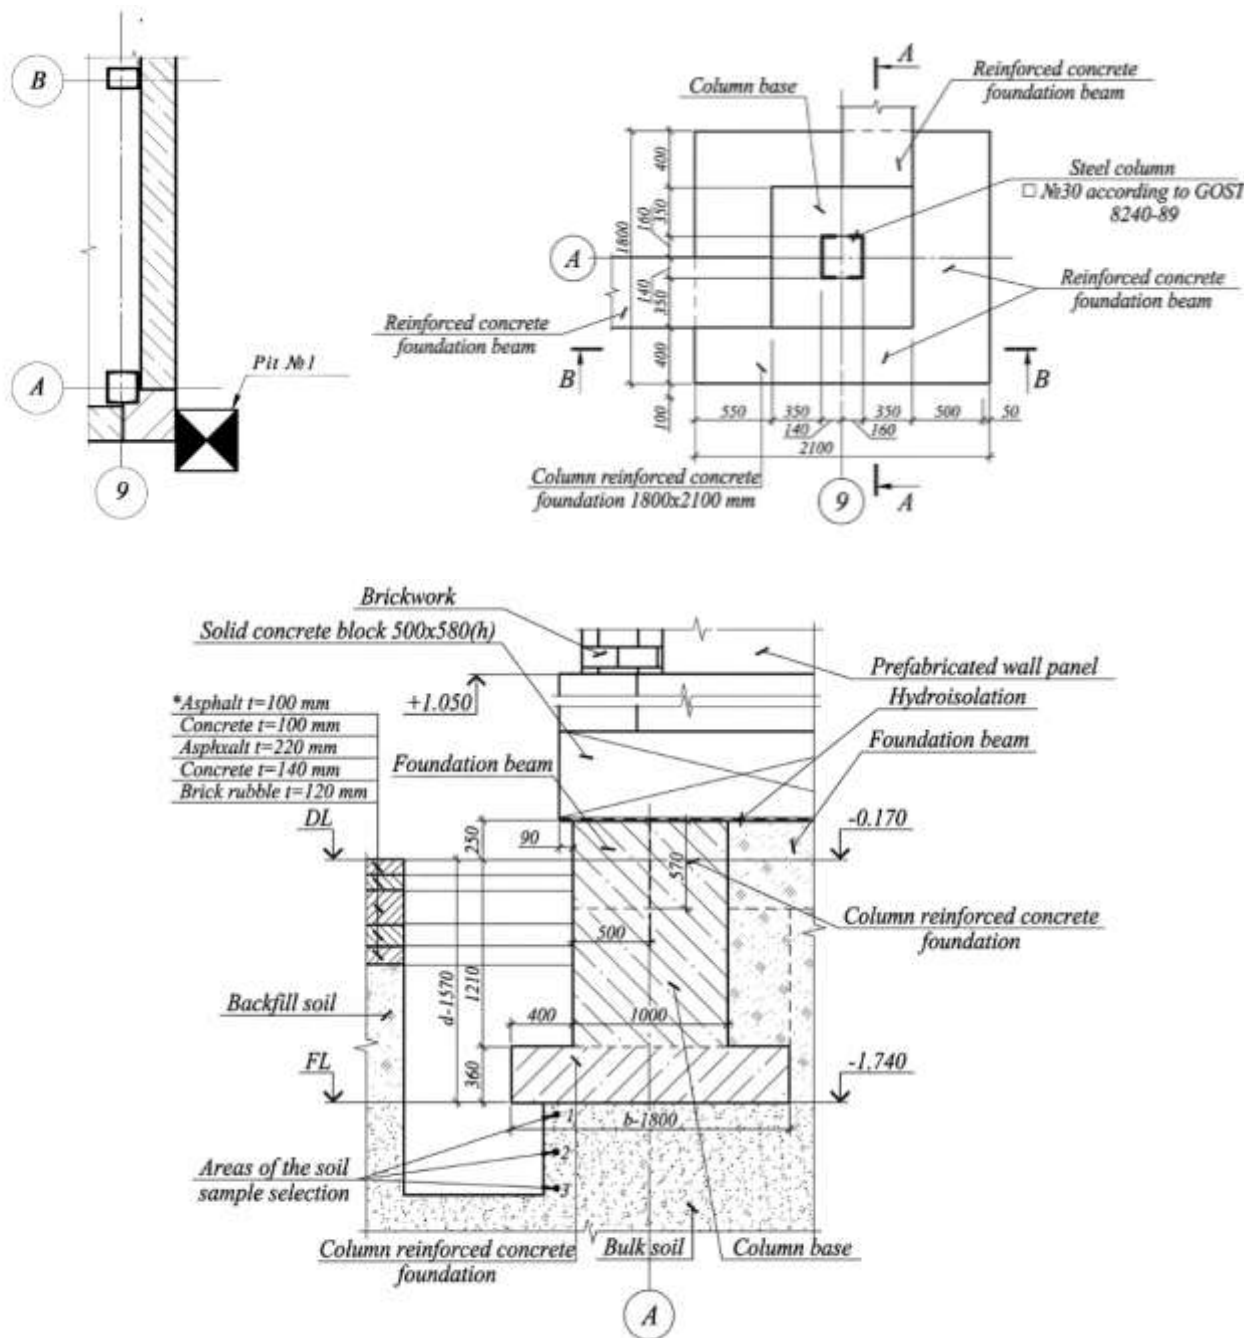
Scheme of the layout of the pit No. 1 and section 1–1 and A–A
